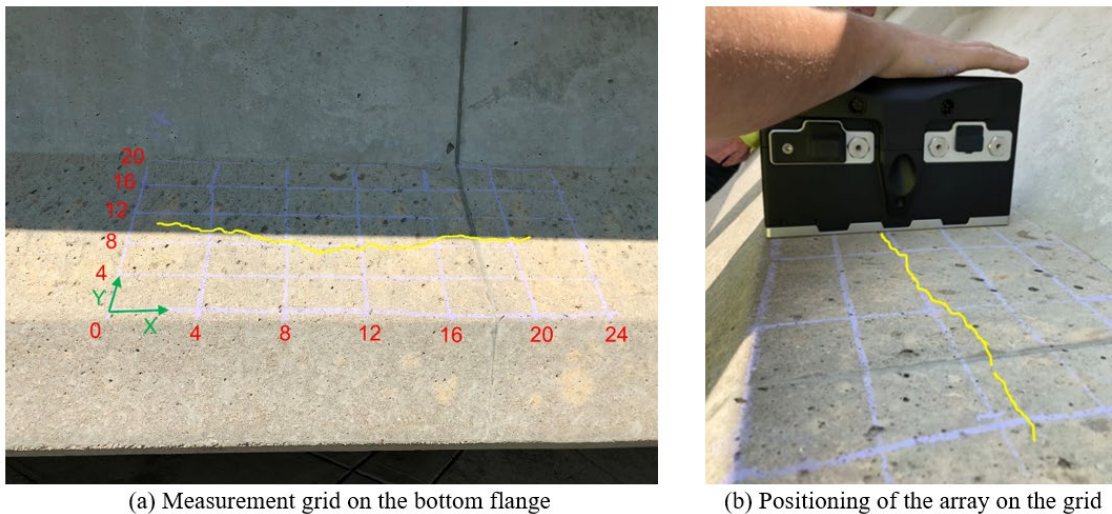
Measurement grid, crack location, and the array position on the fascia beam (S.N. 424)
